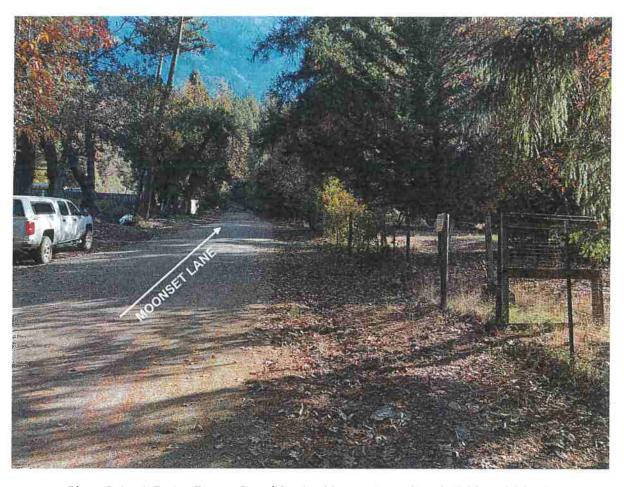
Facing East on Paved Section Moonset Lane (Road Width = ±20 feet).
